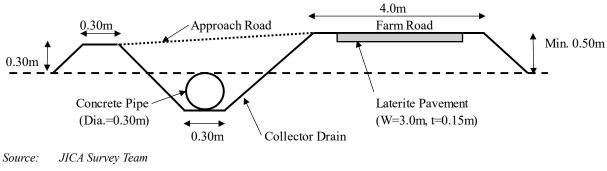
Typical Section of Farm Road and Approach Road
